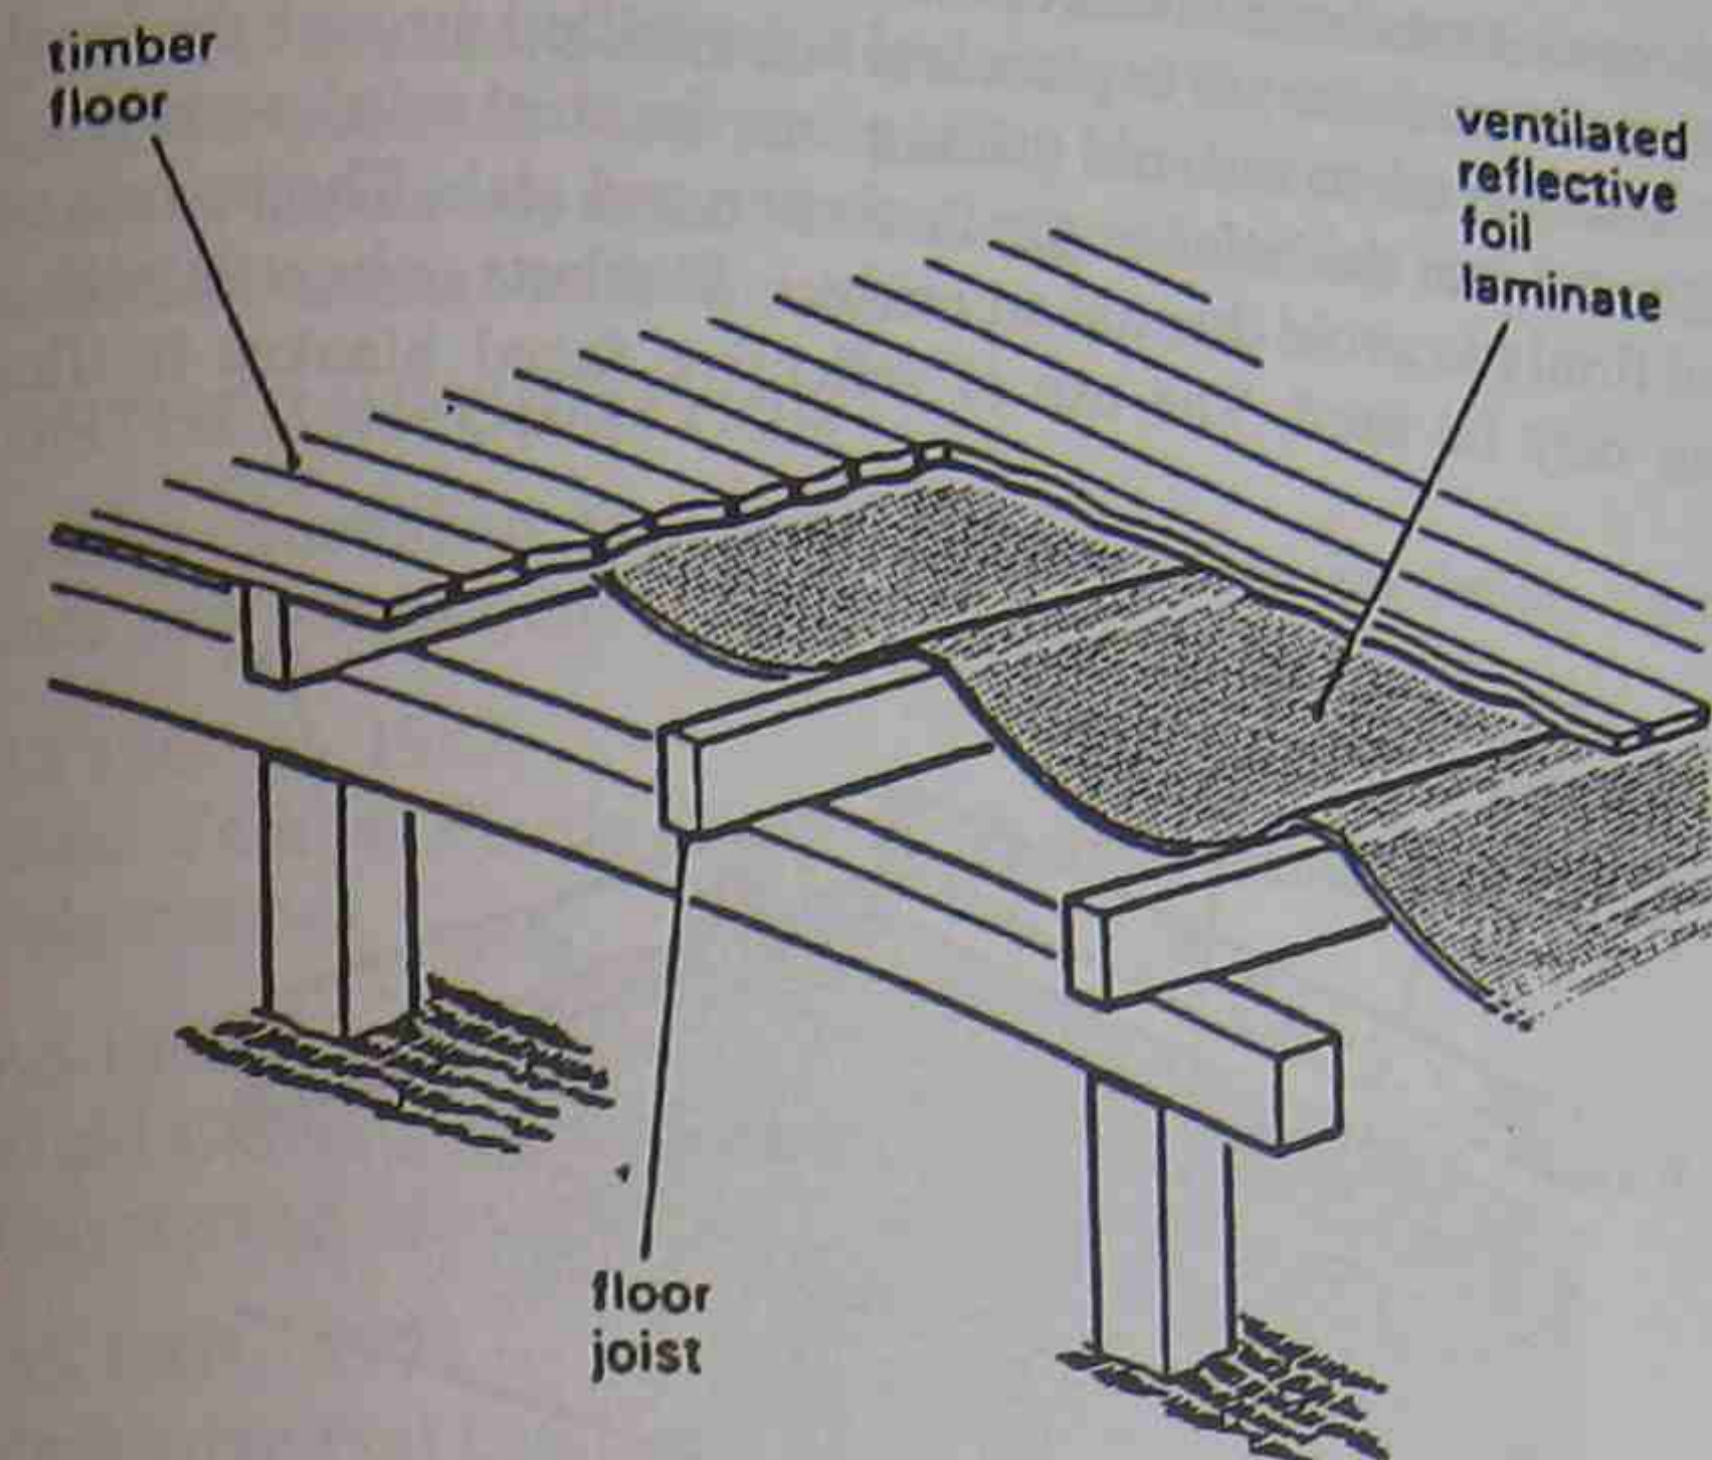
Use of down-facing reflective foil across floor joists. (Source: Glass, Mass and Insulation Council, 1985).
